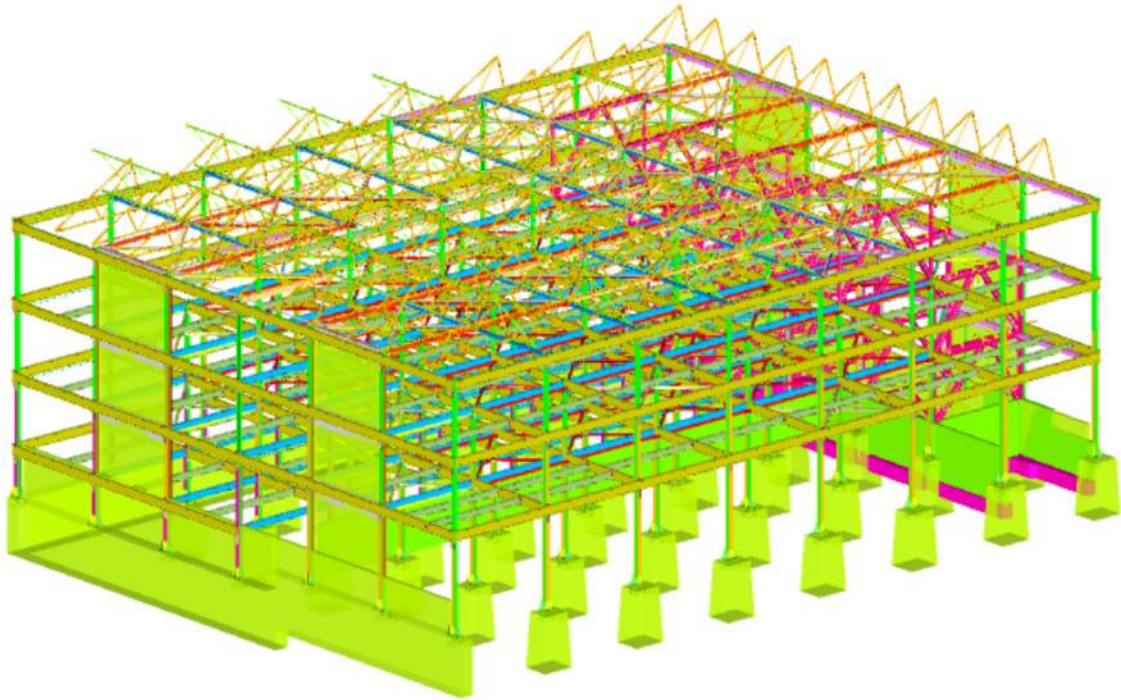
3D model of the strengthened building (Brick facades not shown).
